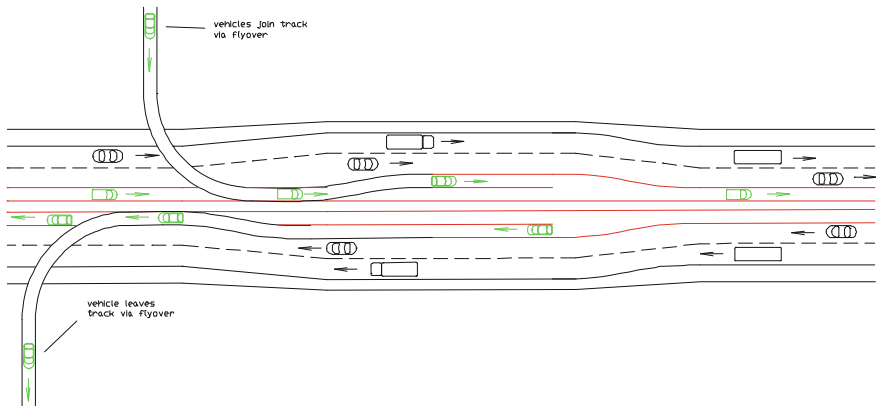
Vehicles join and leave the track via flyovers (Source John Lowry)
